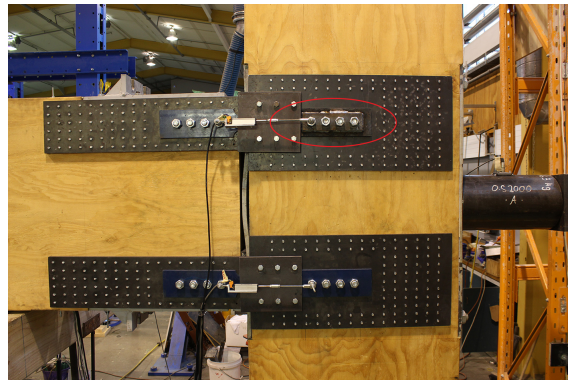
Exploded view of Necked Plate Dissipaters installed using inclined screws
